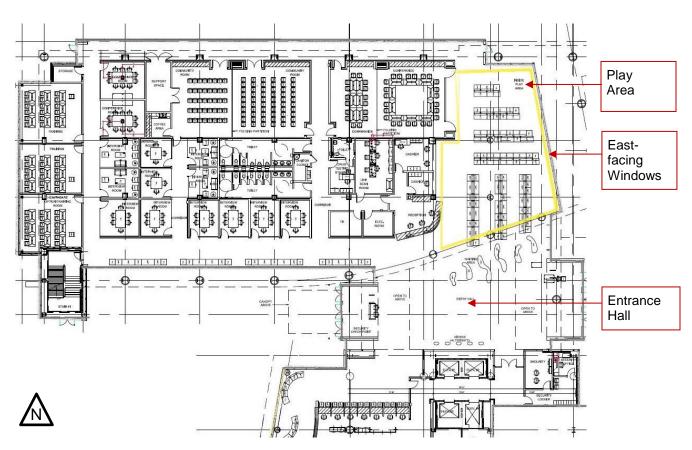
Floor Plan of Family Support Center with East Lobby outlined in Yellow
